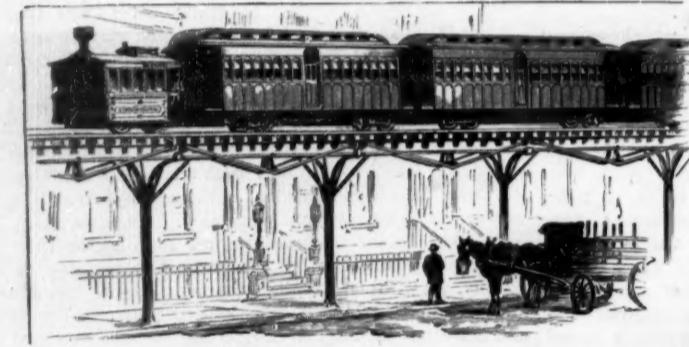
THE FIRST ELEVATED ROAD, WITH ITS LINE OF SINGLE POSTS.
